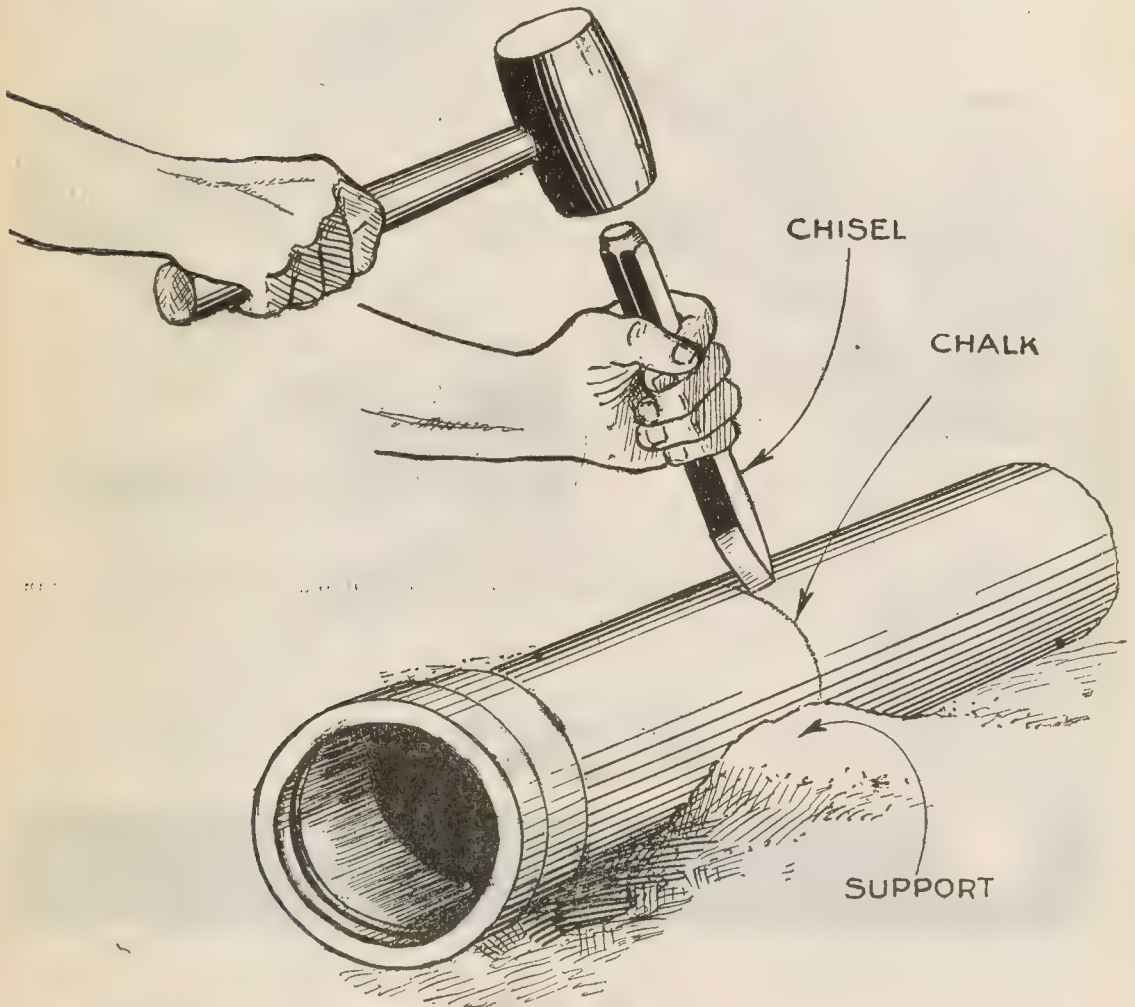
,853.—Method of cutting cast iron soil pipe with hammer and cold chisel, the pipe being firmly supported on a mound of earth.
